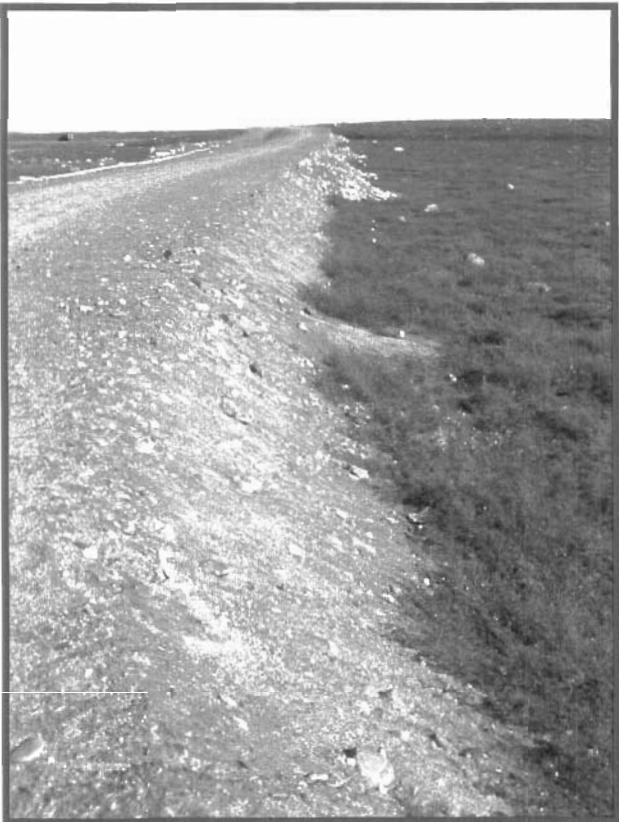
is a view of the broad, well travelled crest looking towards the southeast.
